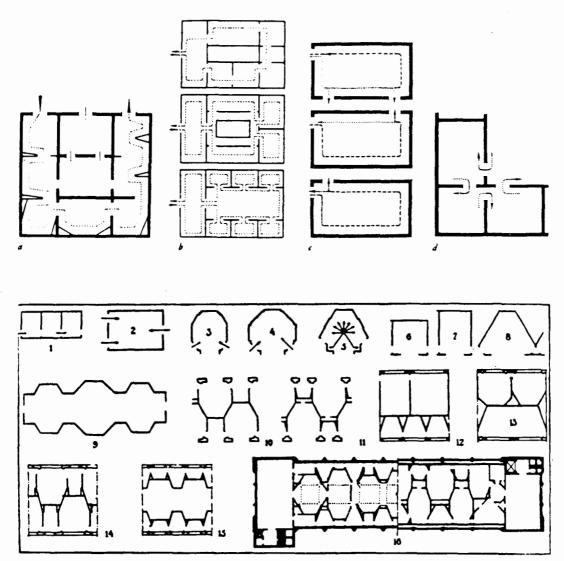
(a) to (d) Floor plans for the location of doors in relation to the use of space. (e) 1 — Traditional location of doors. 2 to 8 — Secondary doors. 9 to 15 — Polygonal enclosures.
